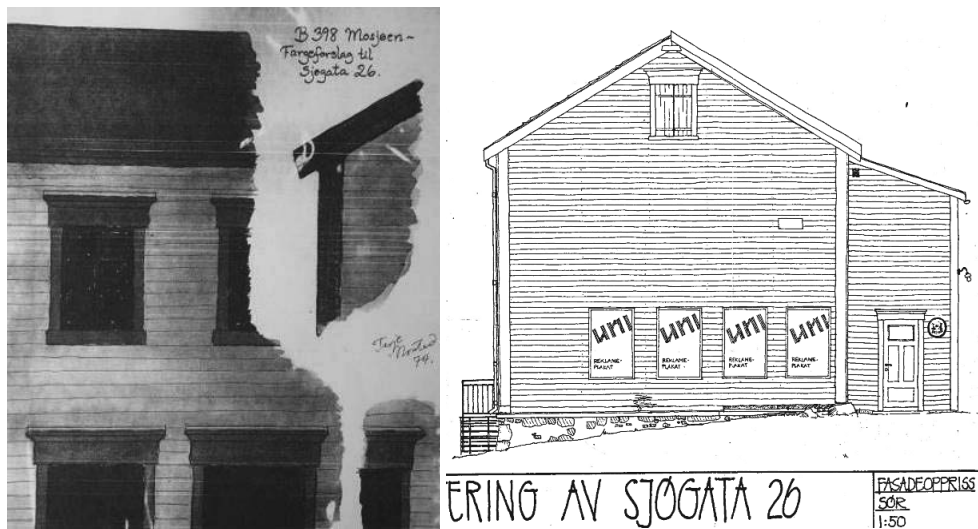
Sjøgata 26, 1974 colour plan for the façade by Terje Norsted, 1974 (left); plan for restoration of the south façade by "Mosjøengruppa" Inst. For Ark. Hist N.T.H. (right). (Vefsn museum archive; Vefsn municipal building archive)
